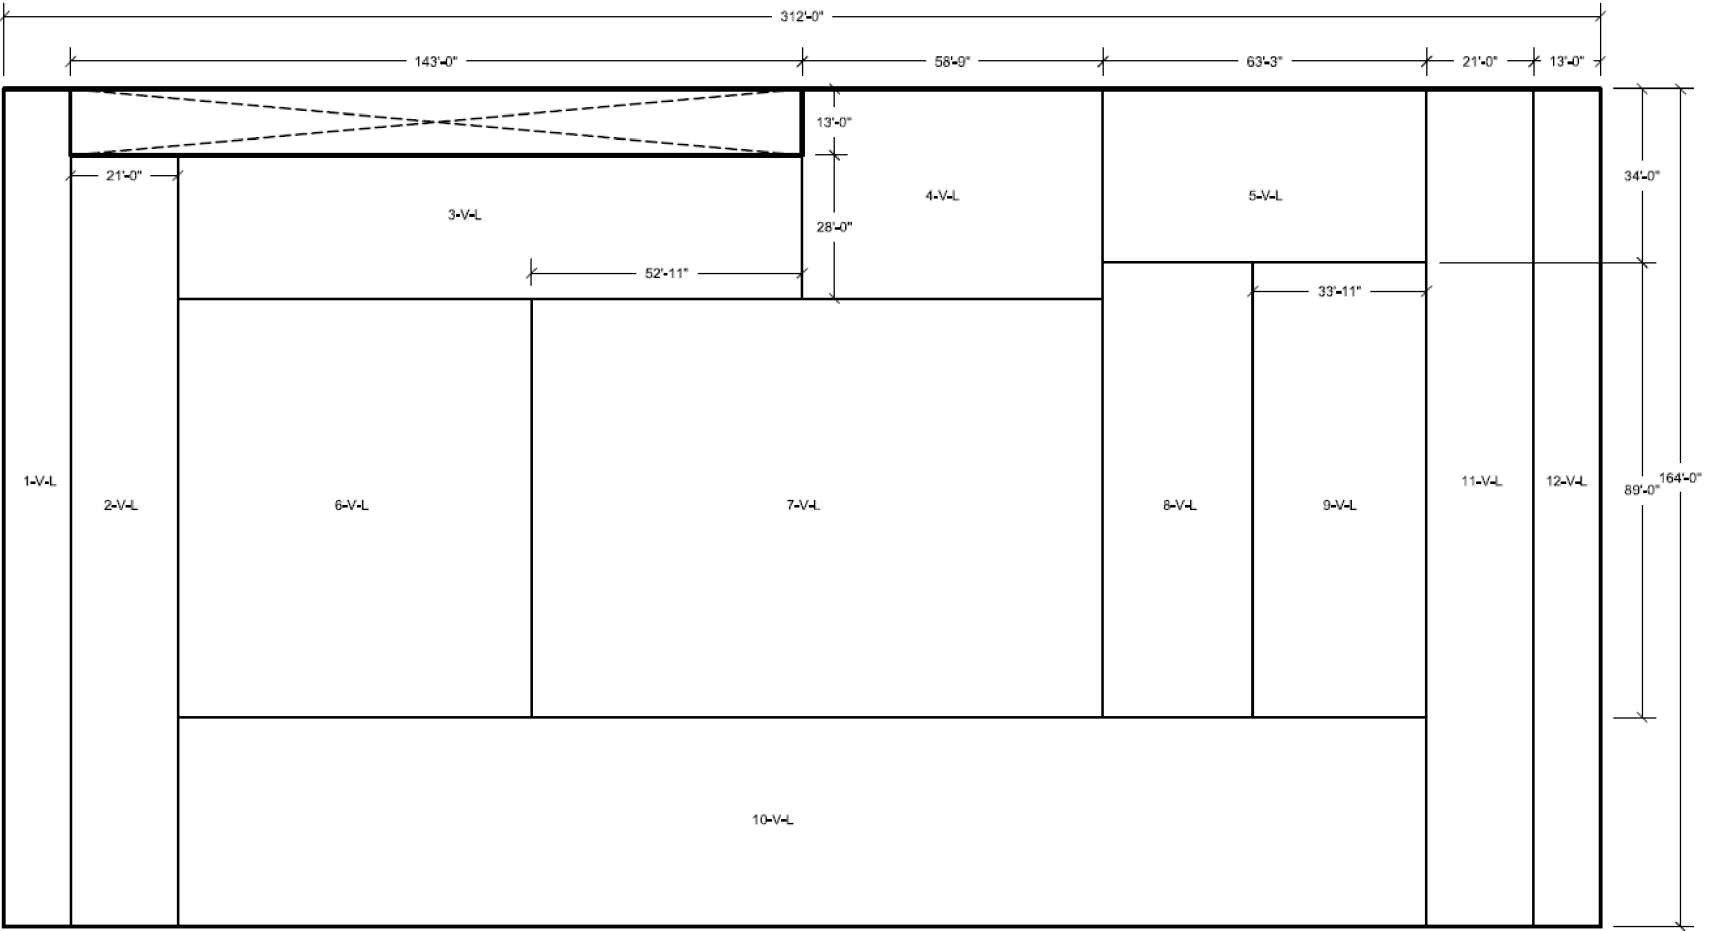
H.6-134 UHS Basin Foundation Mat North/South Reinforcement Zones Bottom Face
